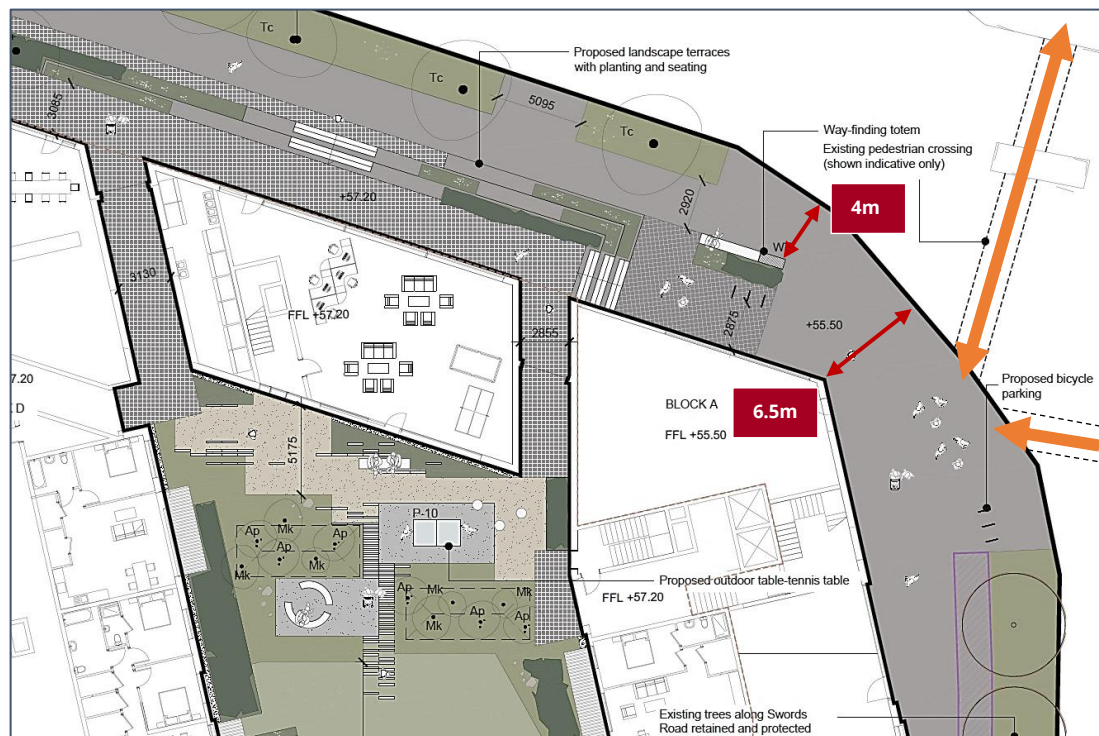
Proposed Landscaping and Footpath to the North-East of Subject Site
